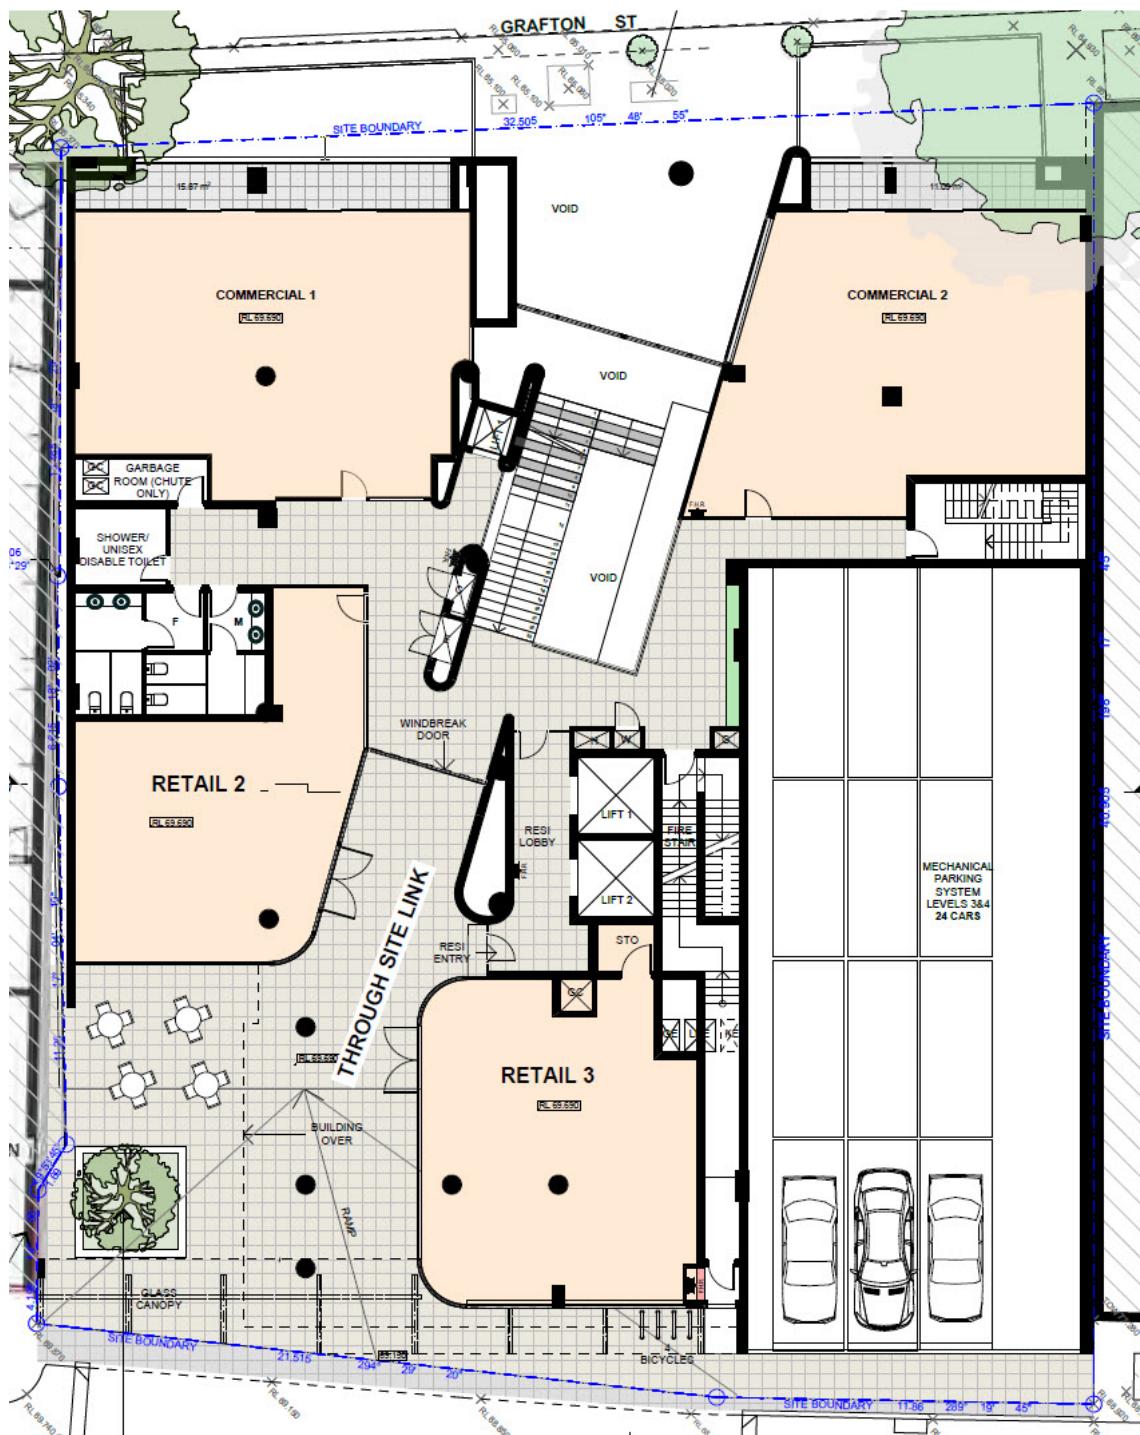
Amended Upper Ground Floor Plan (Source: Cottee Parker JPRA, DA 2101_D)
